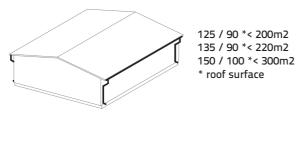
Basic rules for installing gutter systems for Izopanel sandwich panels
